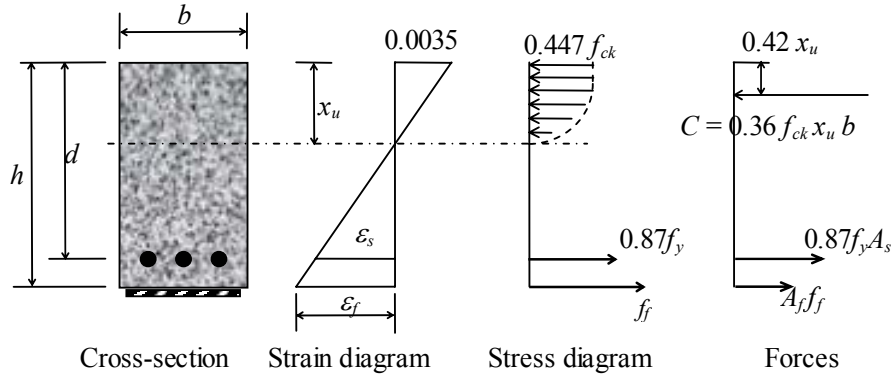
Analysis of a beam section bonded with FRP laminate
